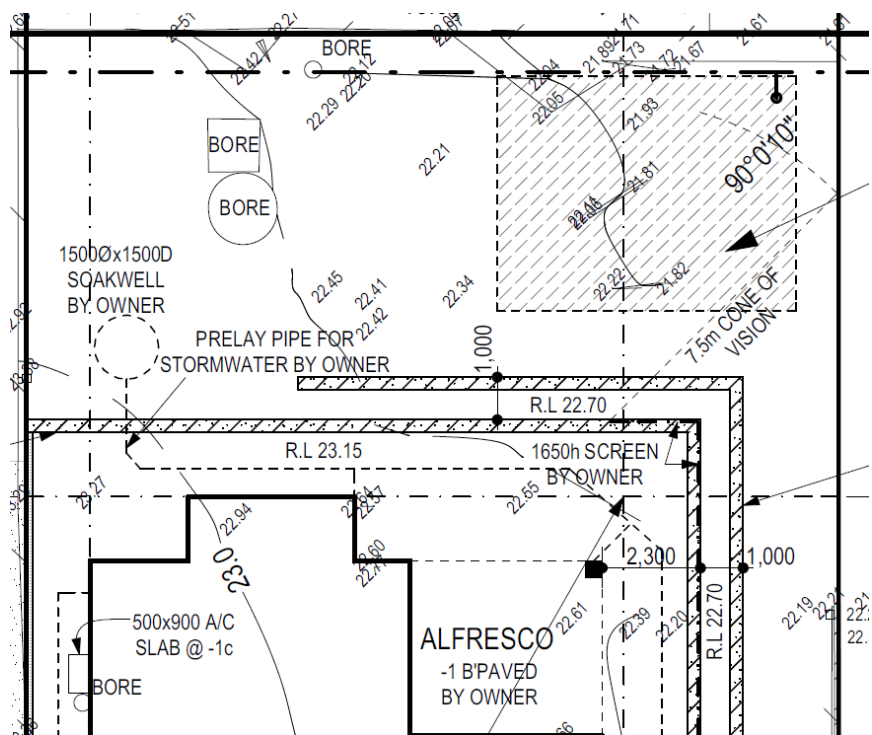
Site plan of the originally approved Single House at No. 123 Lansdowne Road, with terracing shown adjacent to the dwelling.
